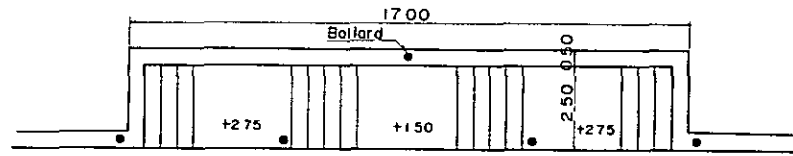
(d) STANDARD SECTION OF MOORING FACILITIES
